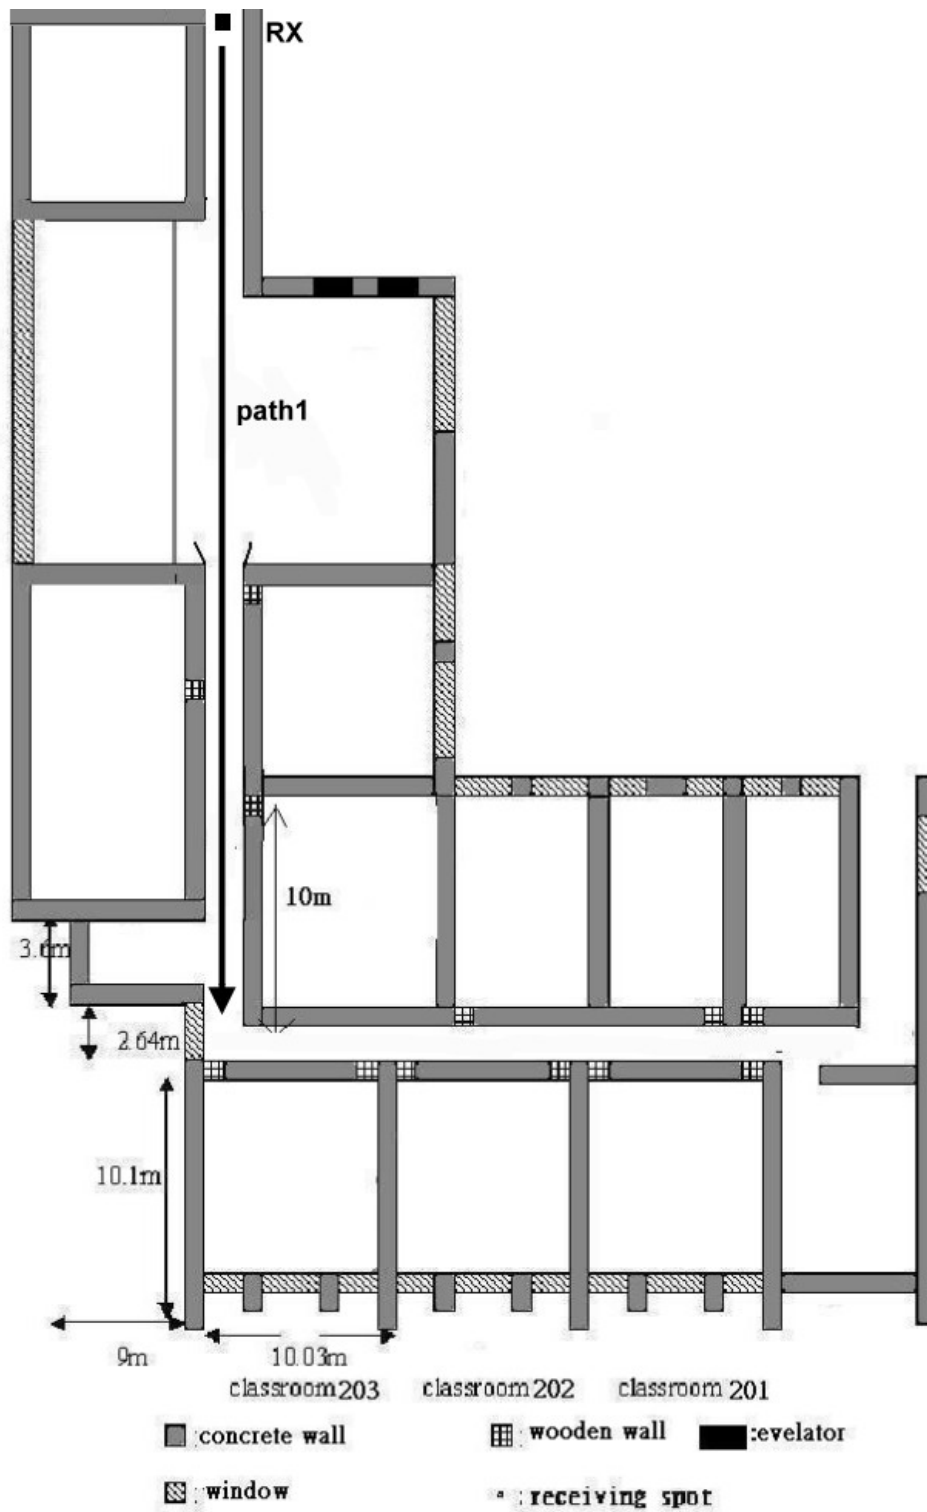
Floor layout of site B located on the second floor of Engineering Building No4
